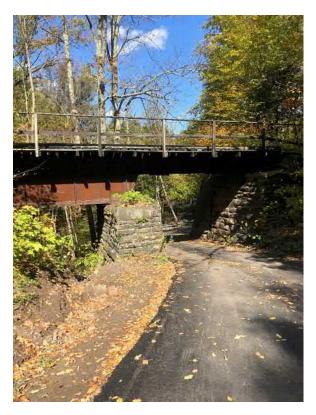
Railroad bridge over Stream 5 (to left) and Mill Street.
